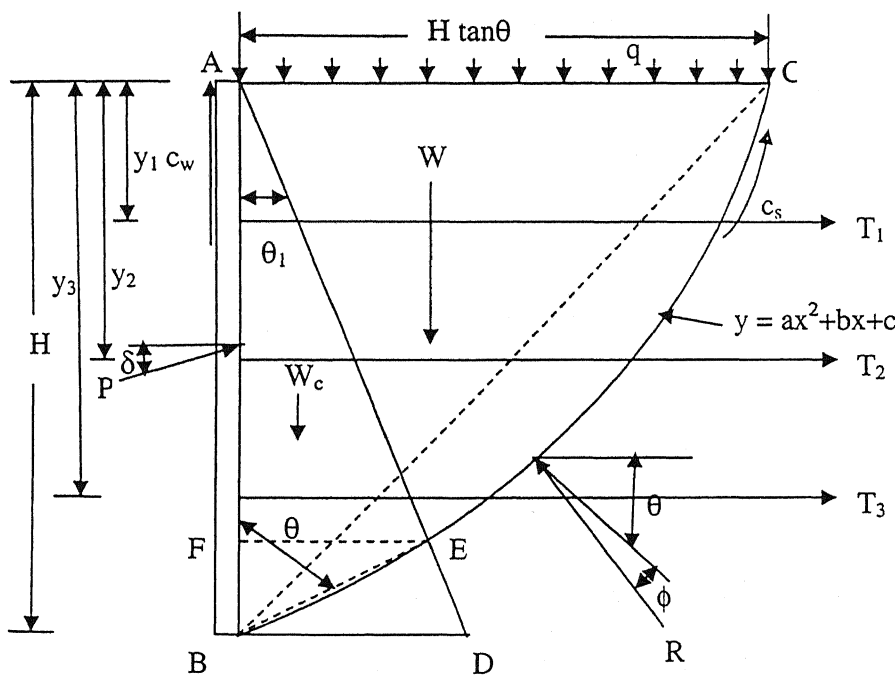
Forces acting on counterfort retaining wall (uniform surcharge, reinforced backfill)
